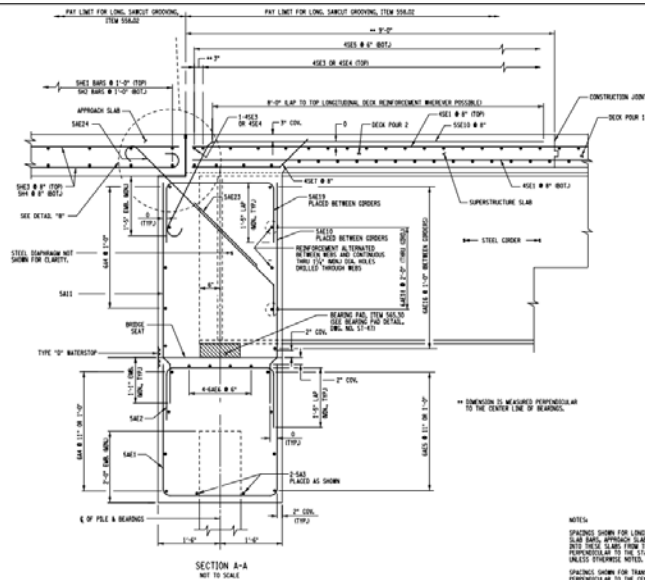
Semi-abutment detail of NY Route 415 bridge over Meads Creek
